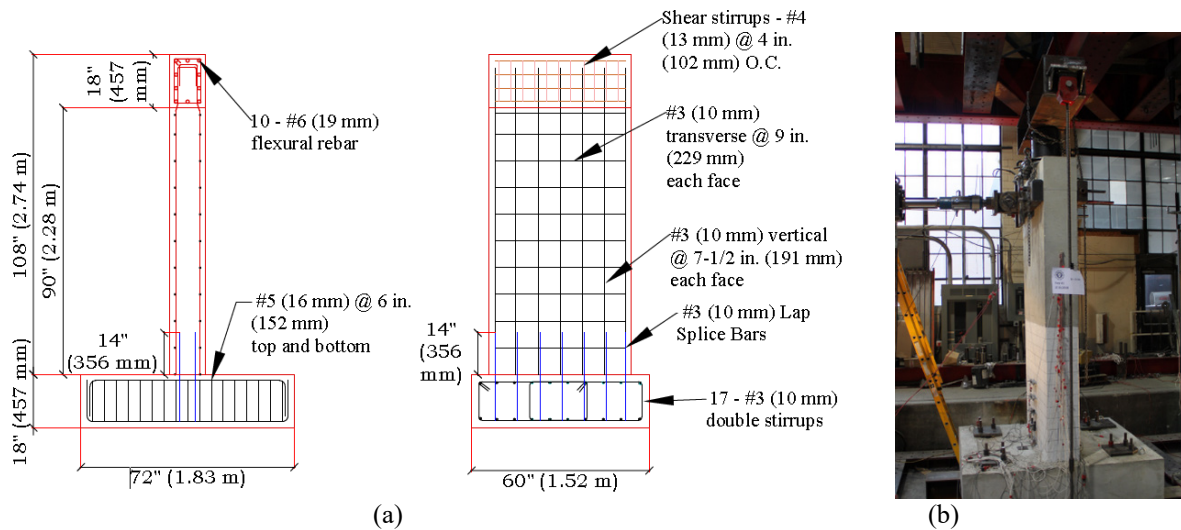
Concrete wall pier: (a) as-built wall pier details and reinforcement; (b) test setup
